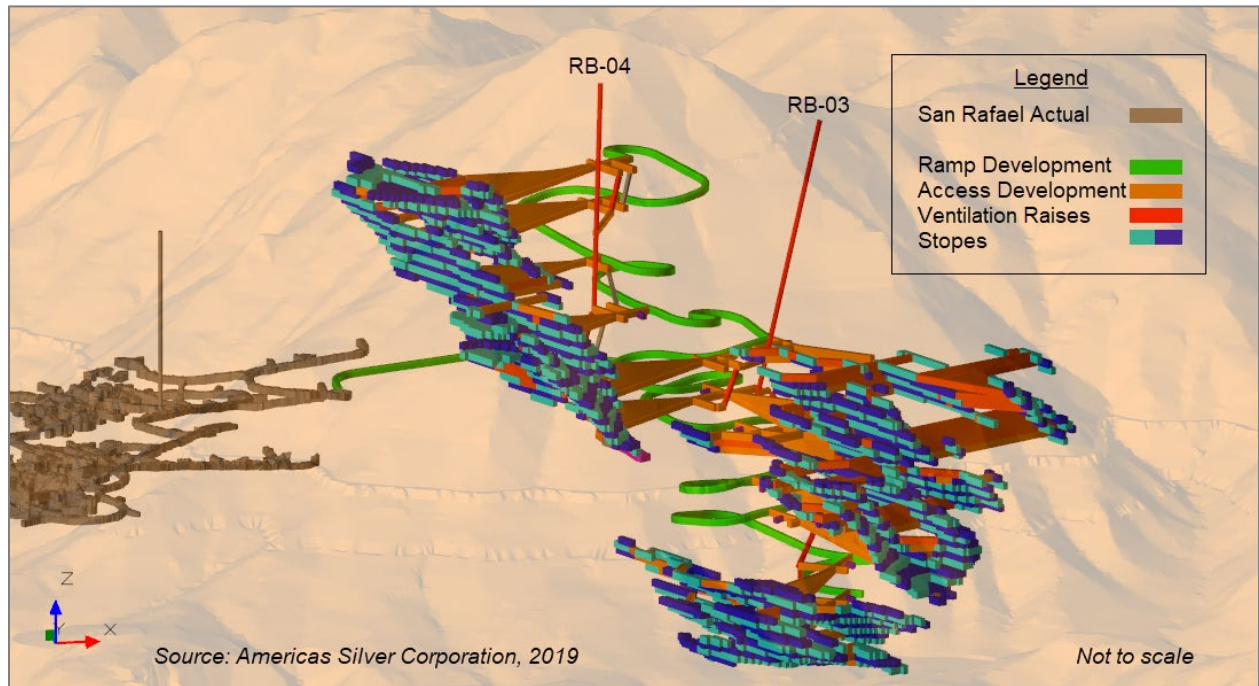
ZONE 120 MINE DESIGN LAYOUT
